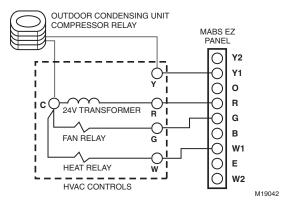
Single-stage heating and cooling equipment wiring diagram.
